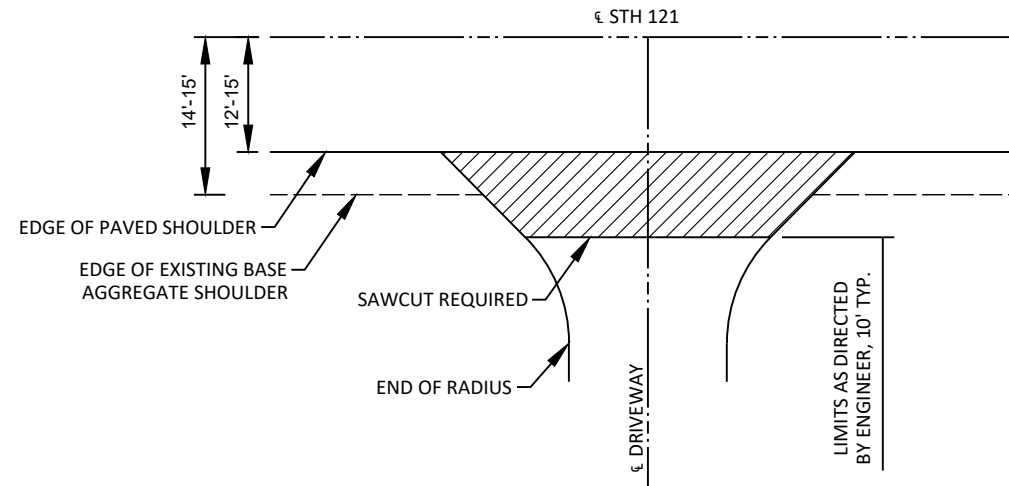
DETAIL OF SIDE ROAD BUTT JOINT - RURAL
